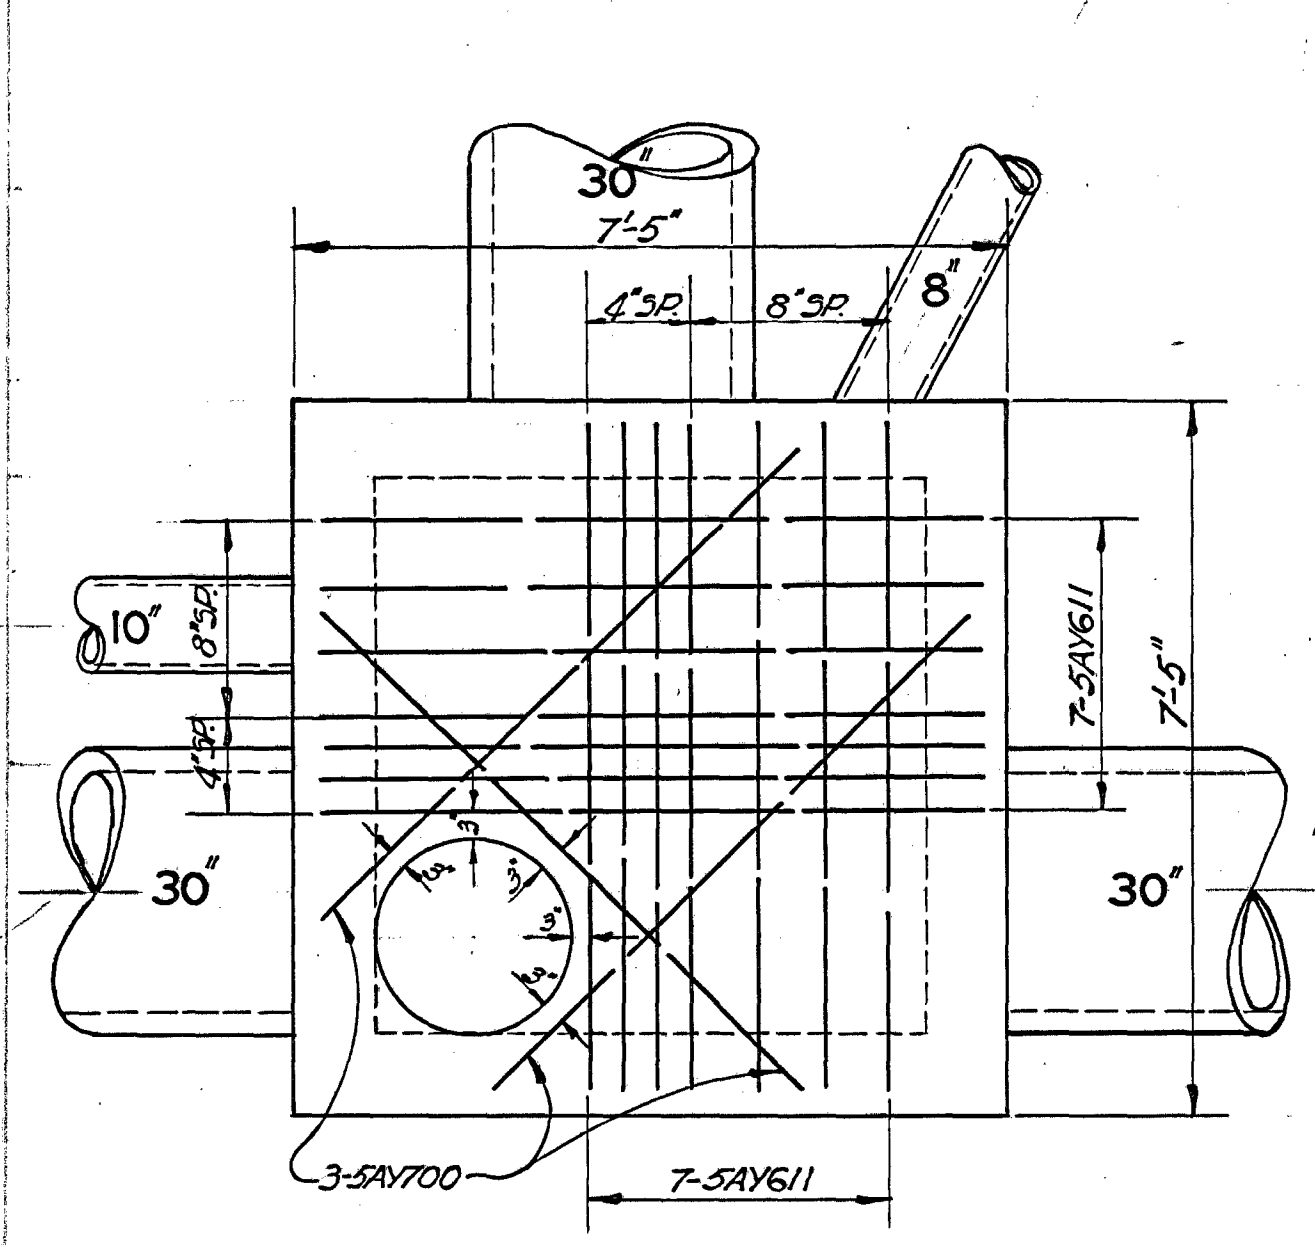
PLAN, PROFILE, E.P. & R.E. STANDARD
